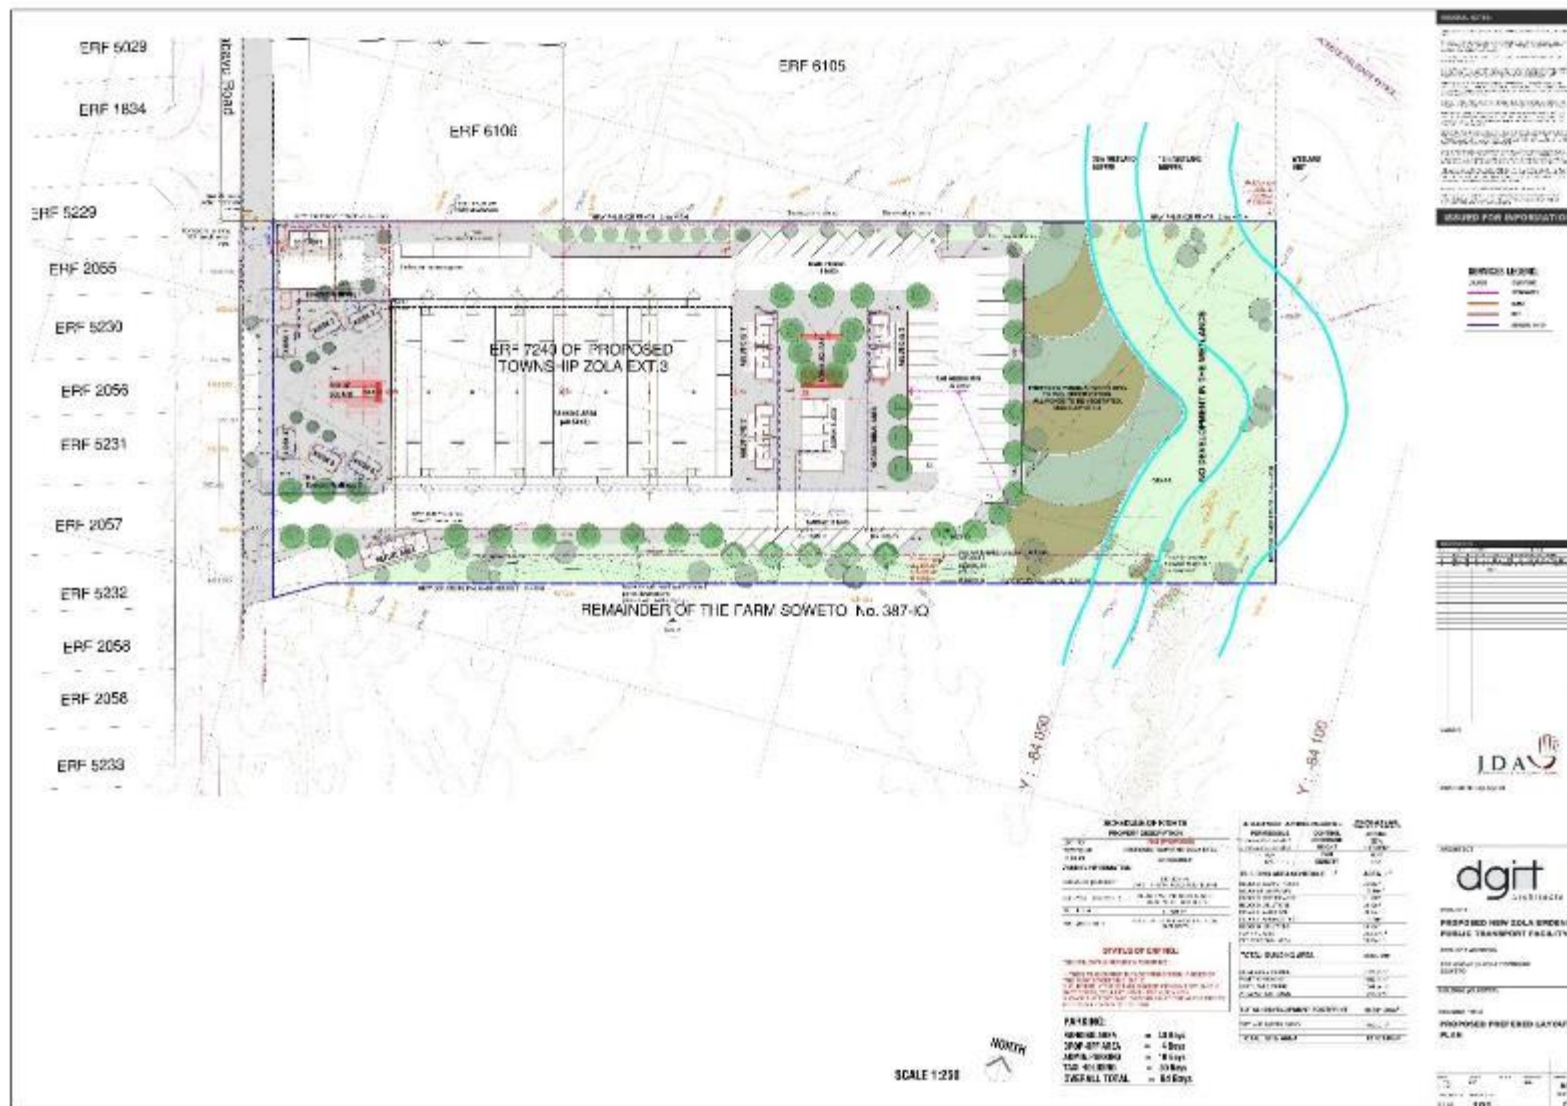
Public transport facility, Zola, site development layout plan for the new preferred layout proposal in relation to the wetlands.
